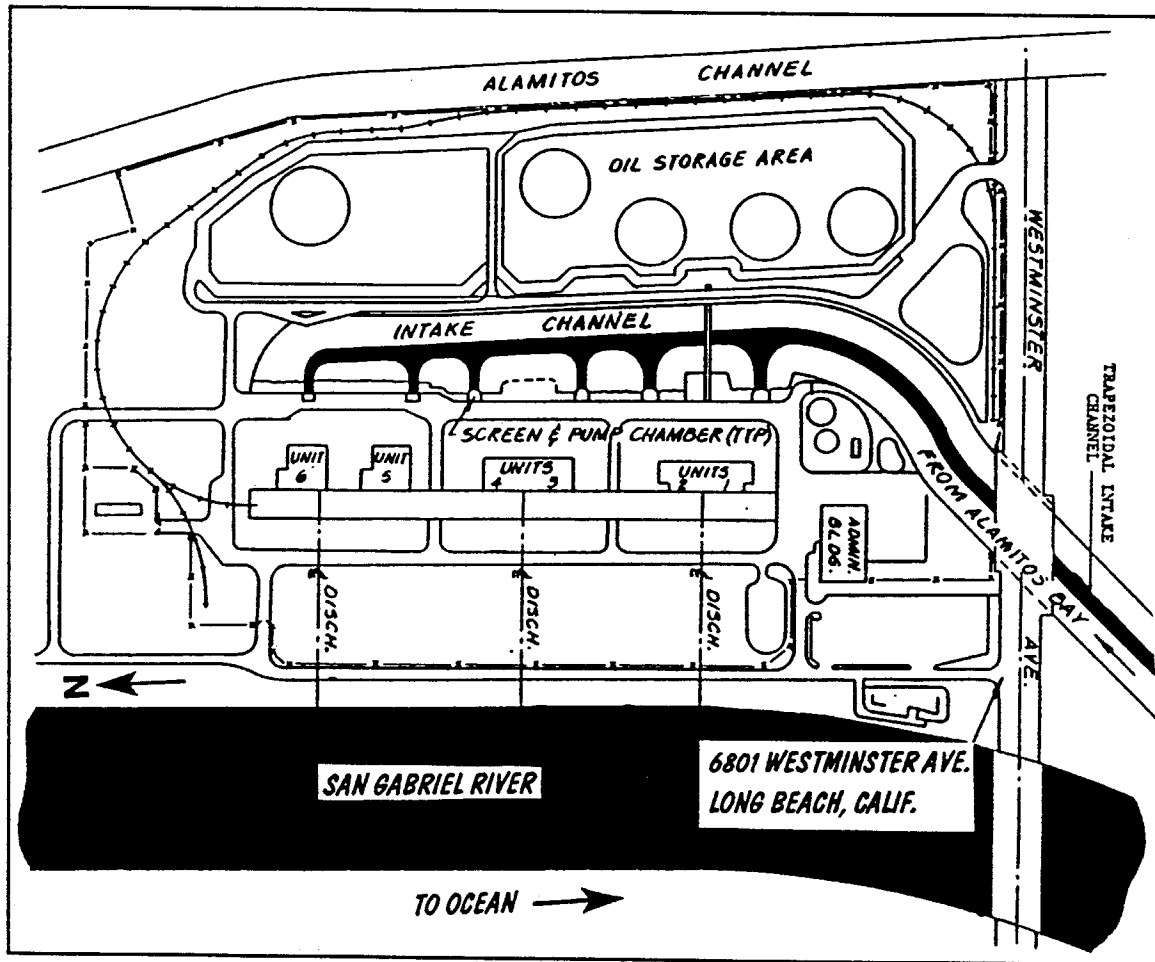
Haynes Generating Station site plan (IRC 1981b).
